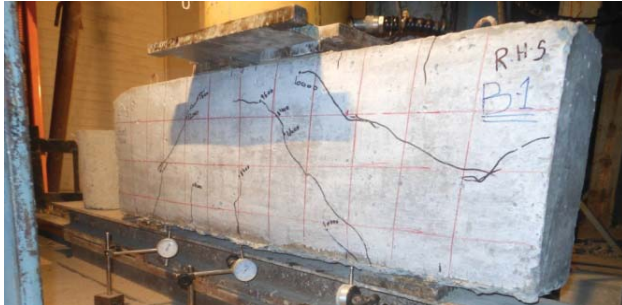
381mm (15in) deep beam crack pattern
